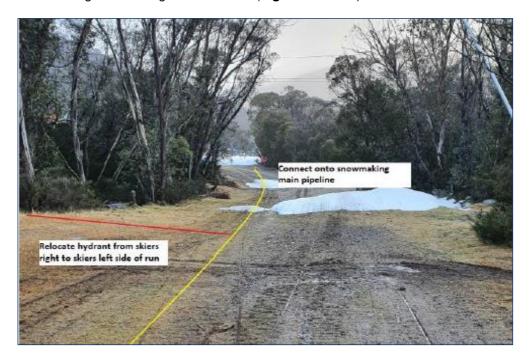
| Alignment of pipe and hydrants along Sundowner ski run (Source: Applicant's documentation)
